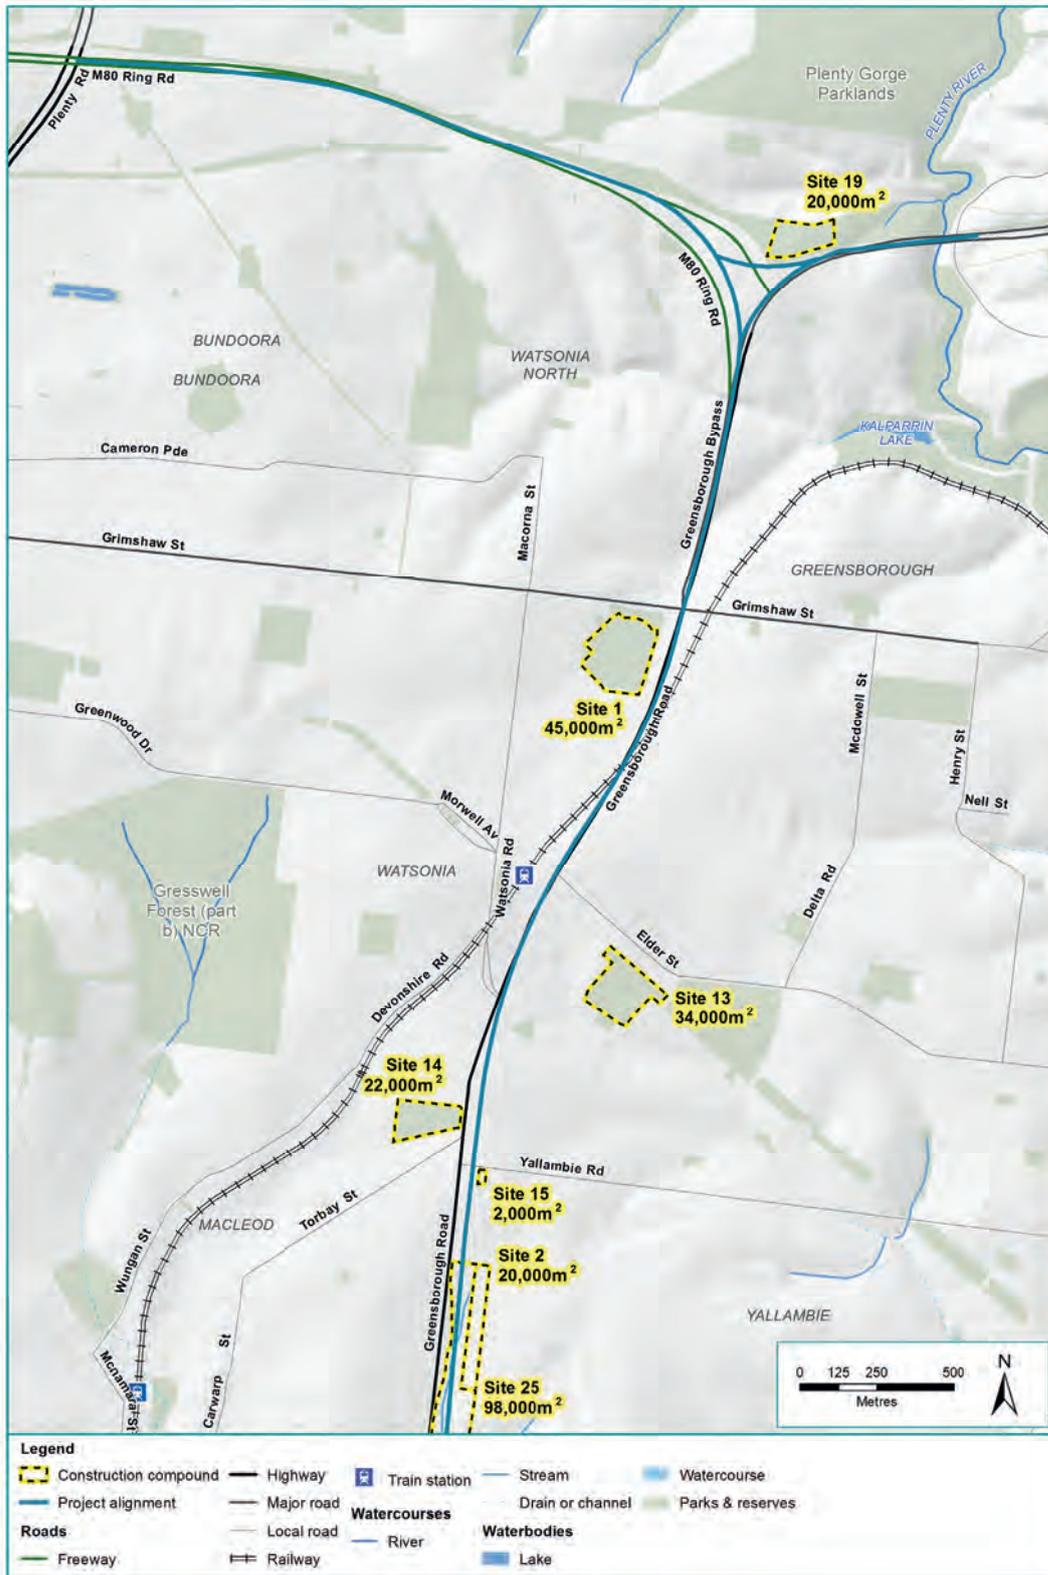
Construction compounds from the M80 Ring Road to northern portal
